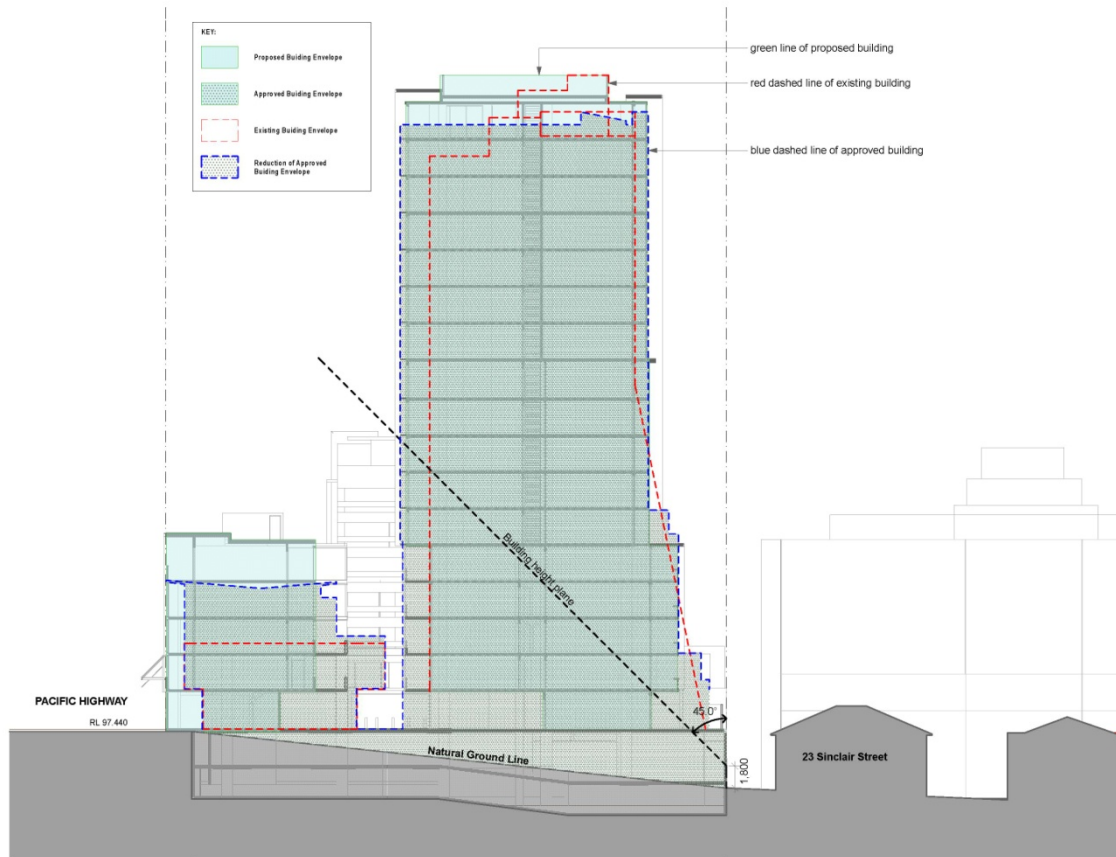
Figure C- Building 1 & 3 BHP (Cl. 30(2) (a)) compliance plan (existing, approved/commenced & proposed) (Source JPRA)
